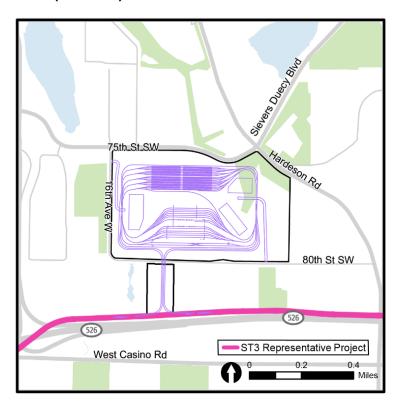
OMF Site: 75th St W & 16th Ave W (Site B-2) Conceptual Layout
